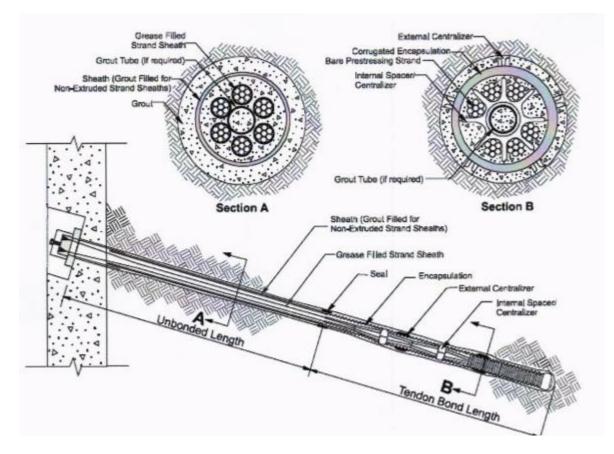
Schematic diagram of a Cable Anchor (Ref FHWA)
